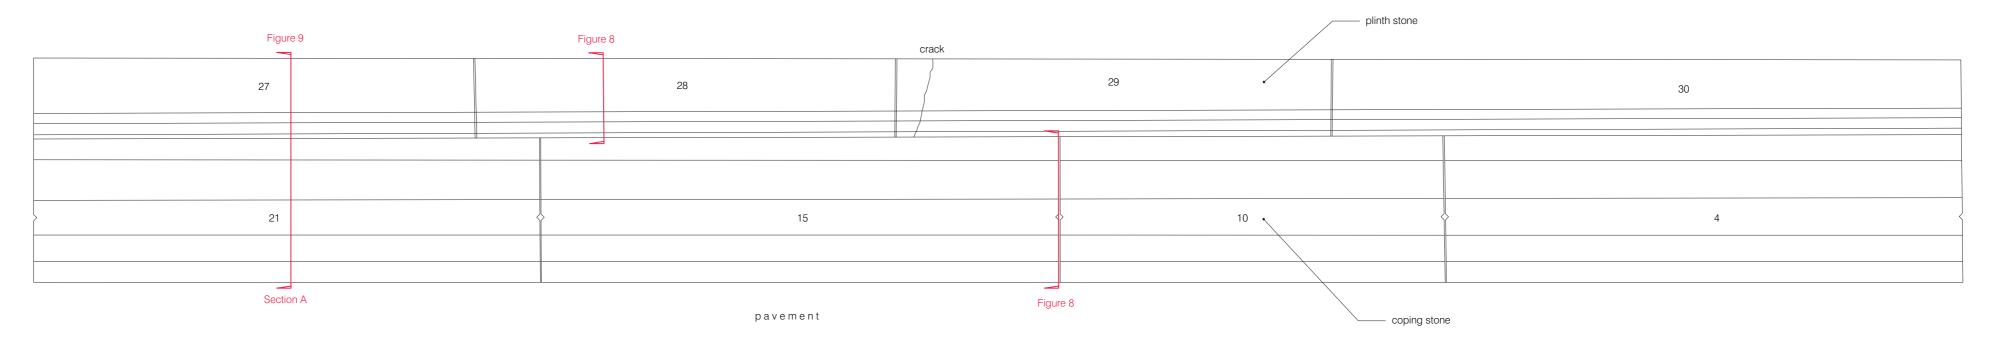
Plan of plinth CIS13 Chiswick Bridge 1:10 at A2
